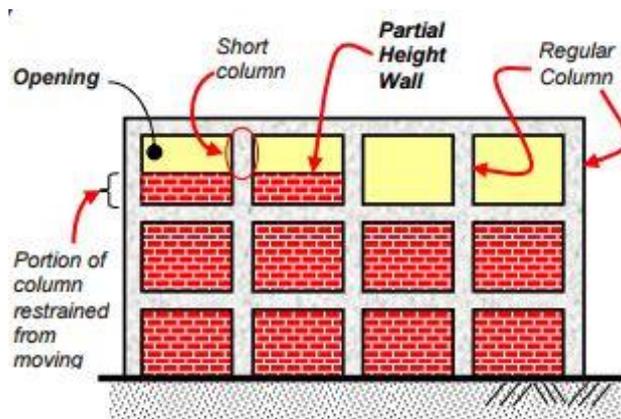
Short columns effect in RC buildings when partial height walls adjoin columns.
